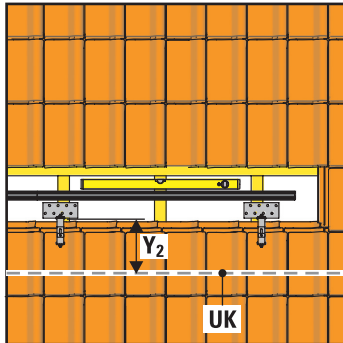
Aligning the on-roof ties from the planned lower edge of the solar panels at distance Y_2
